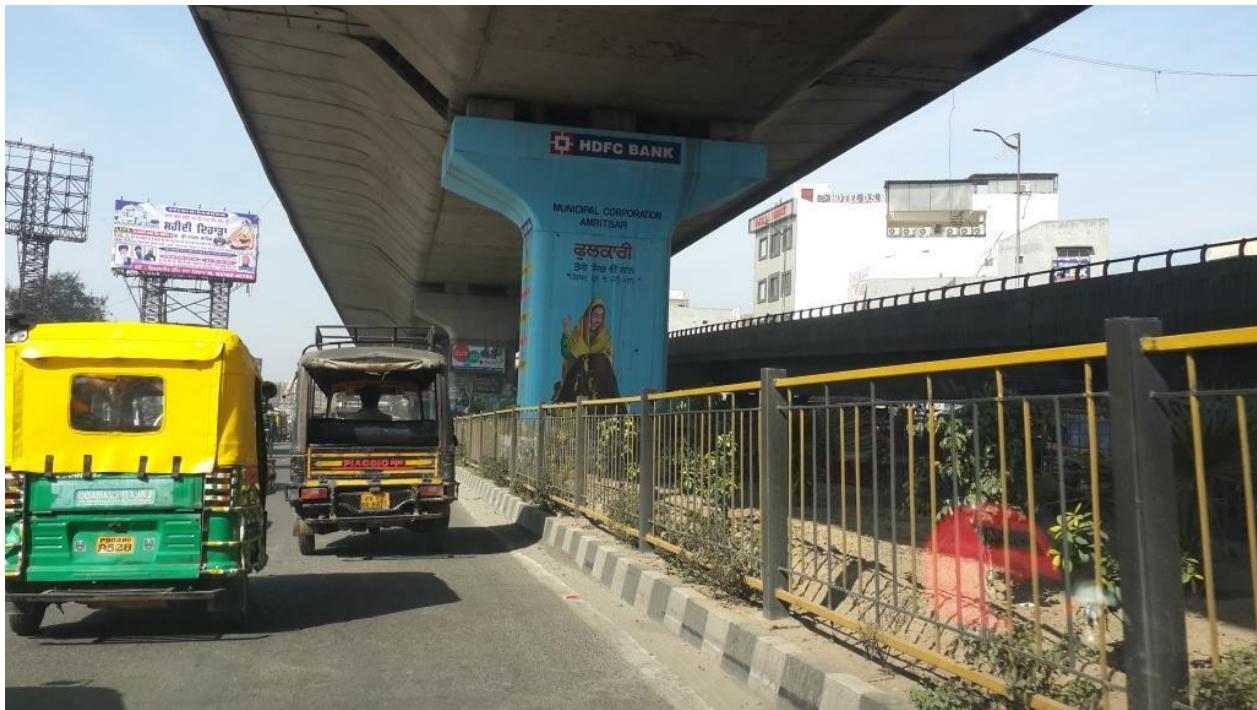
Existing planting at spaces below Elevated loop on GT road. (Source: Author)
